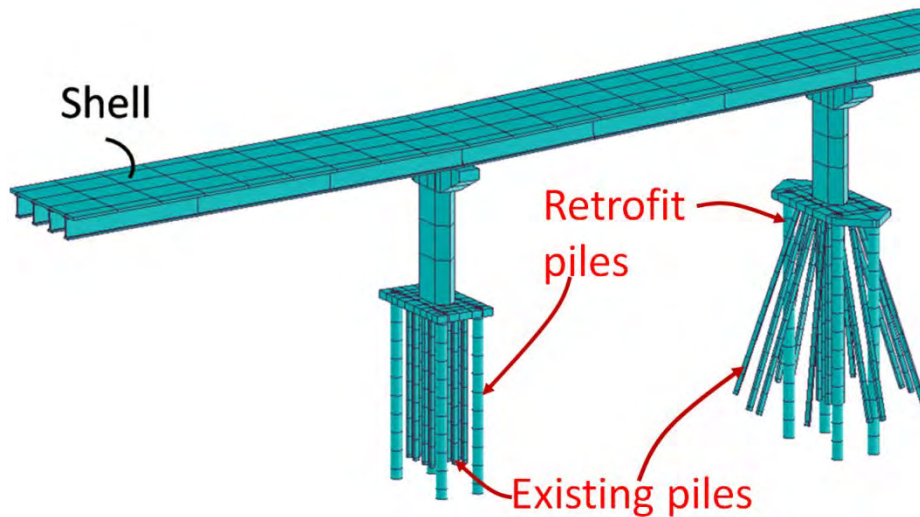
Close-up view of the finite element model of vertical and battered pile foundations.
